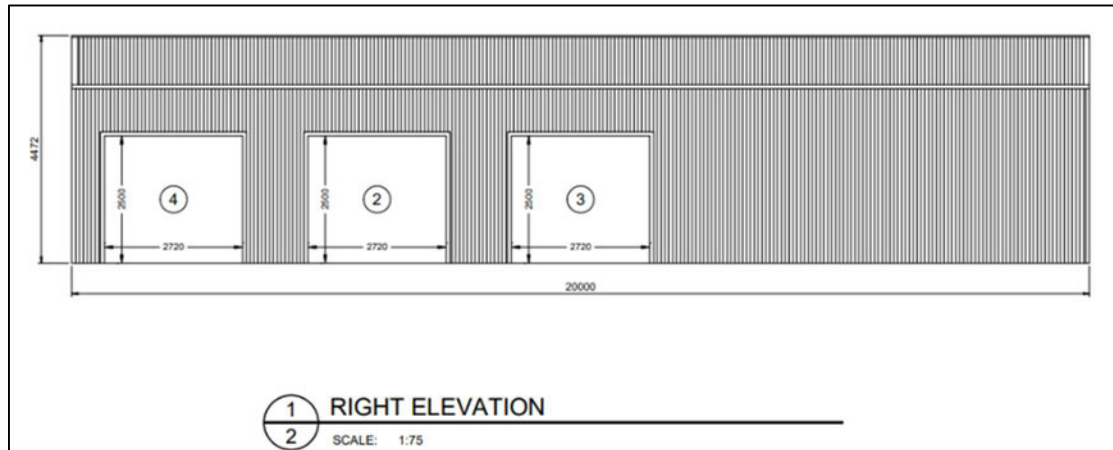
Right Elevation Prepared by Emerald Design and Construction (Appendix 2)
